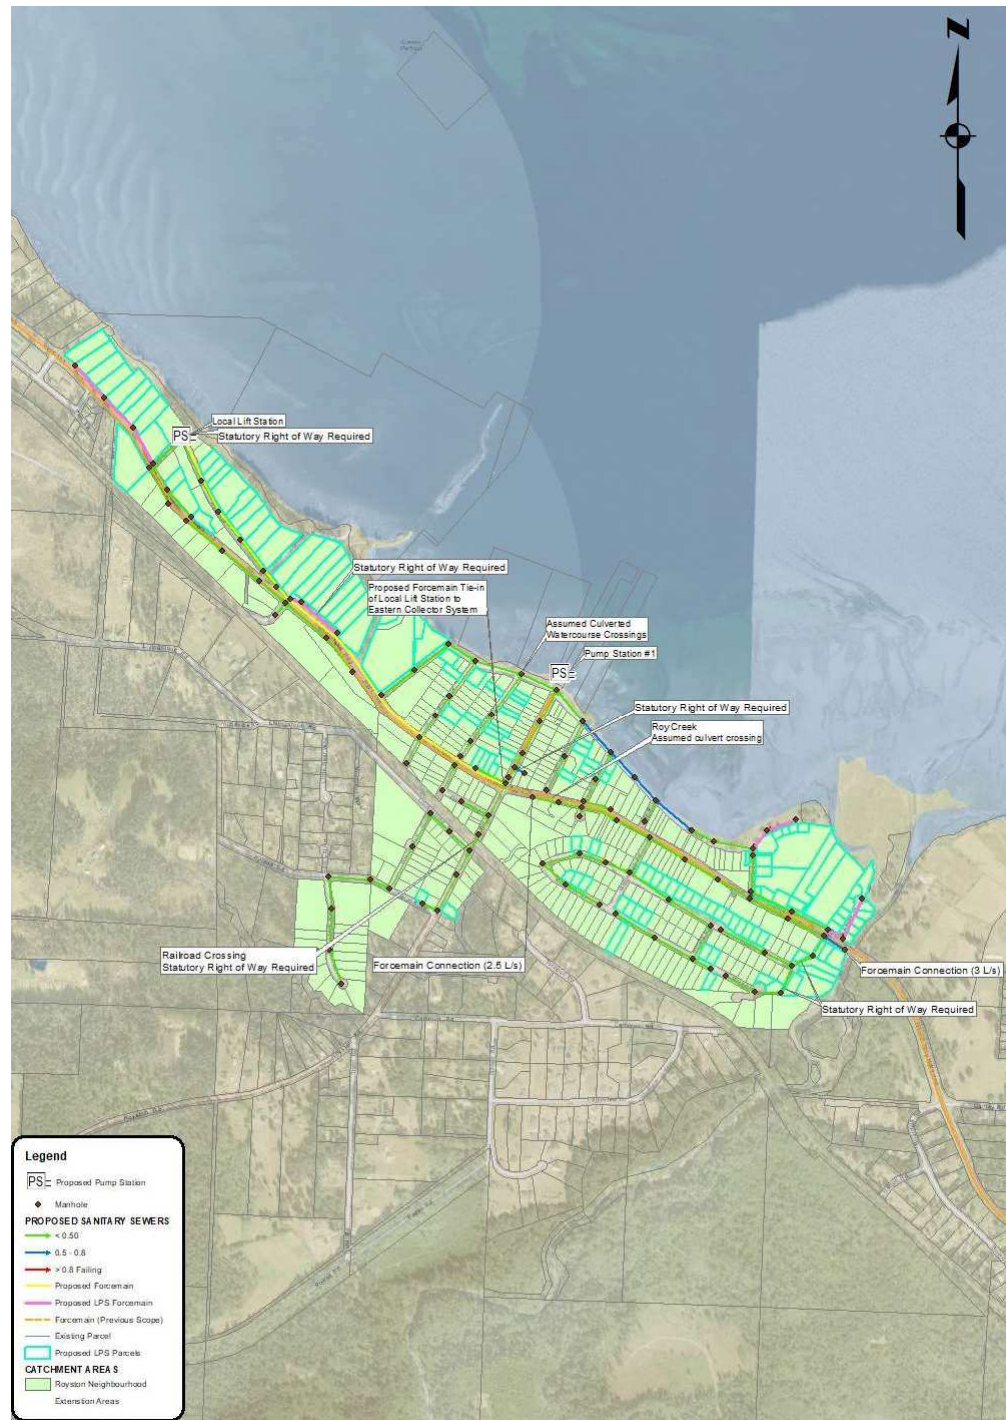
Pump Station #1 Royston Neighbourhood Proposed Collection System
